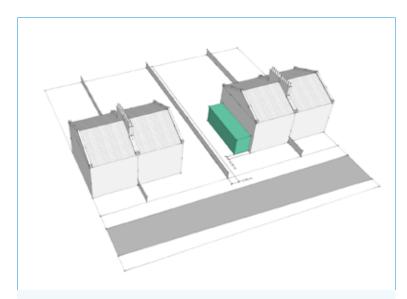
Design principles – setback from existing building by at least 500mm.
